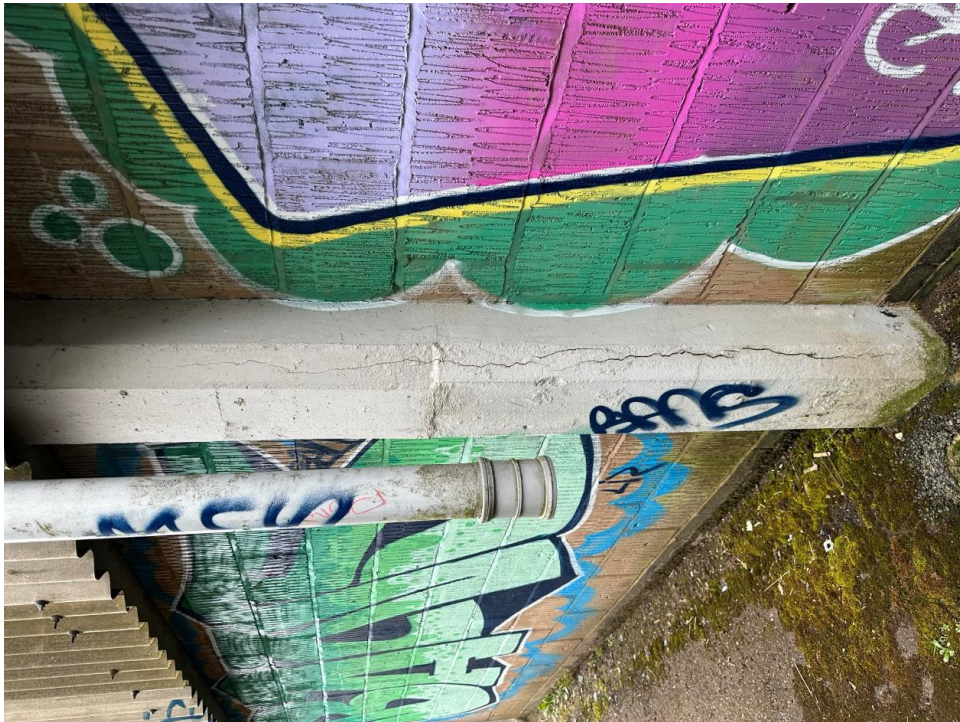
Main Grandstand western rear elevation cracking to column concrete
